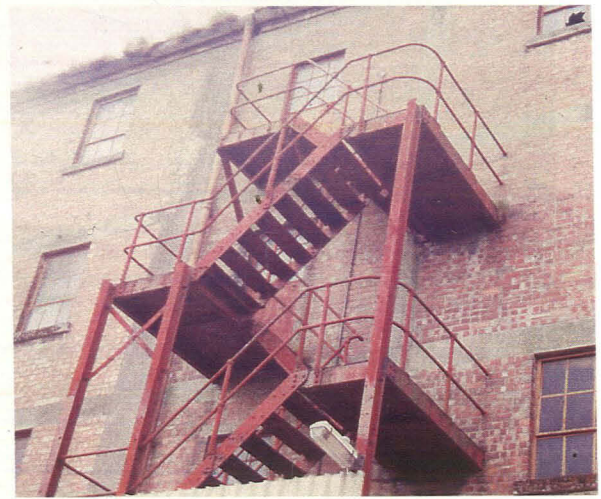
External stairway providing access to Upper floors of Warehouse 1
